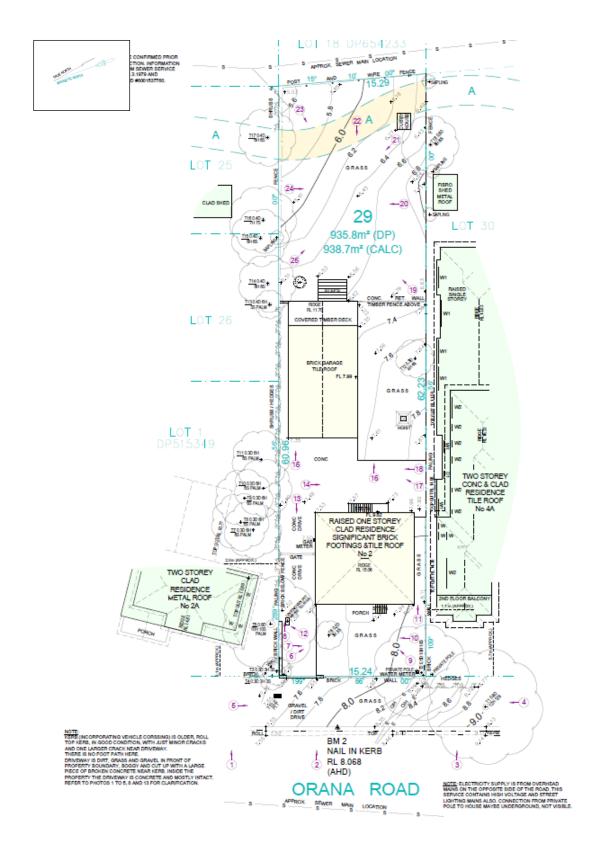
General Topography of the Development Site (Source: Residential Engineering)
